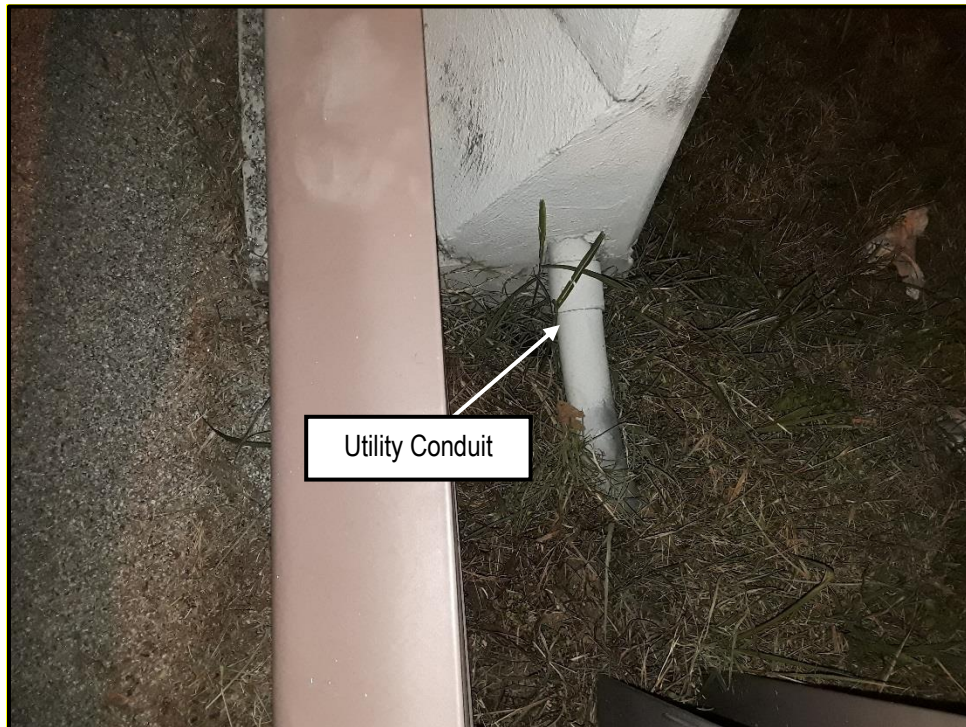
View of utility conduit on the SR-1 Ramp over I-440
